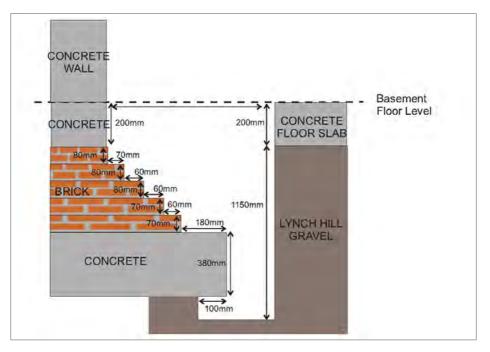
Trial Pit Sketch of Façade foundation along Capper St
